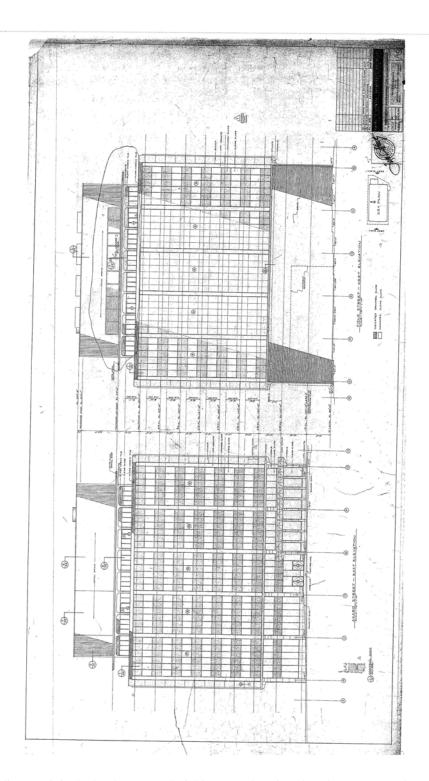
Mayflower Building - Original Akard Street and Field Street Elevations by Thomas E. Stanley Architects Engineers, dated May 1964.
